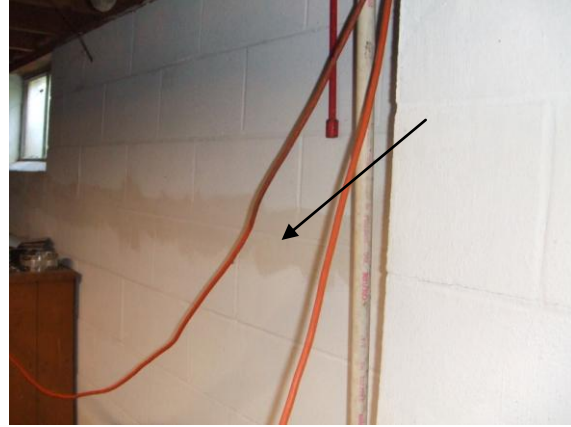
Previous repairs visible (darker paint) on basement walls.
